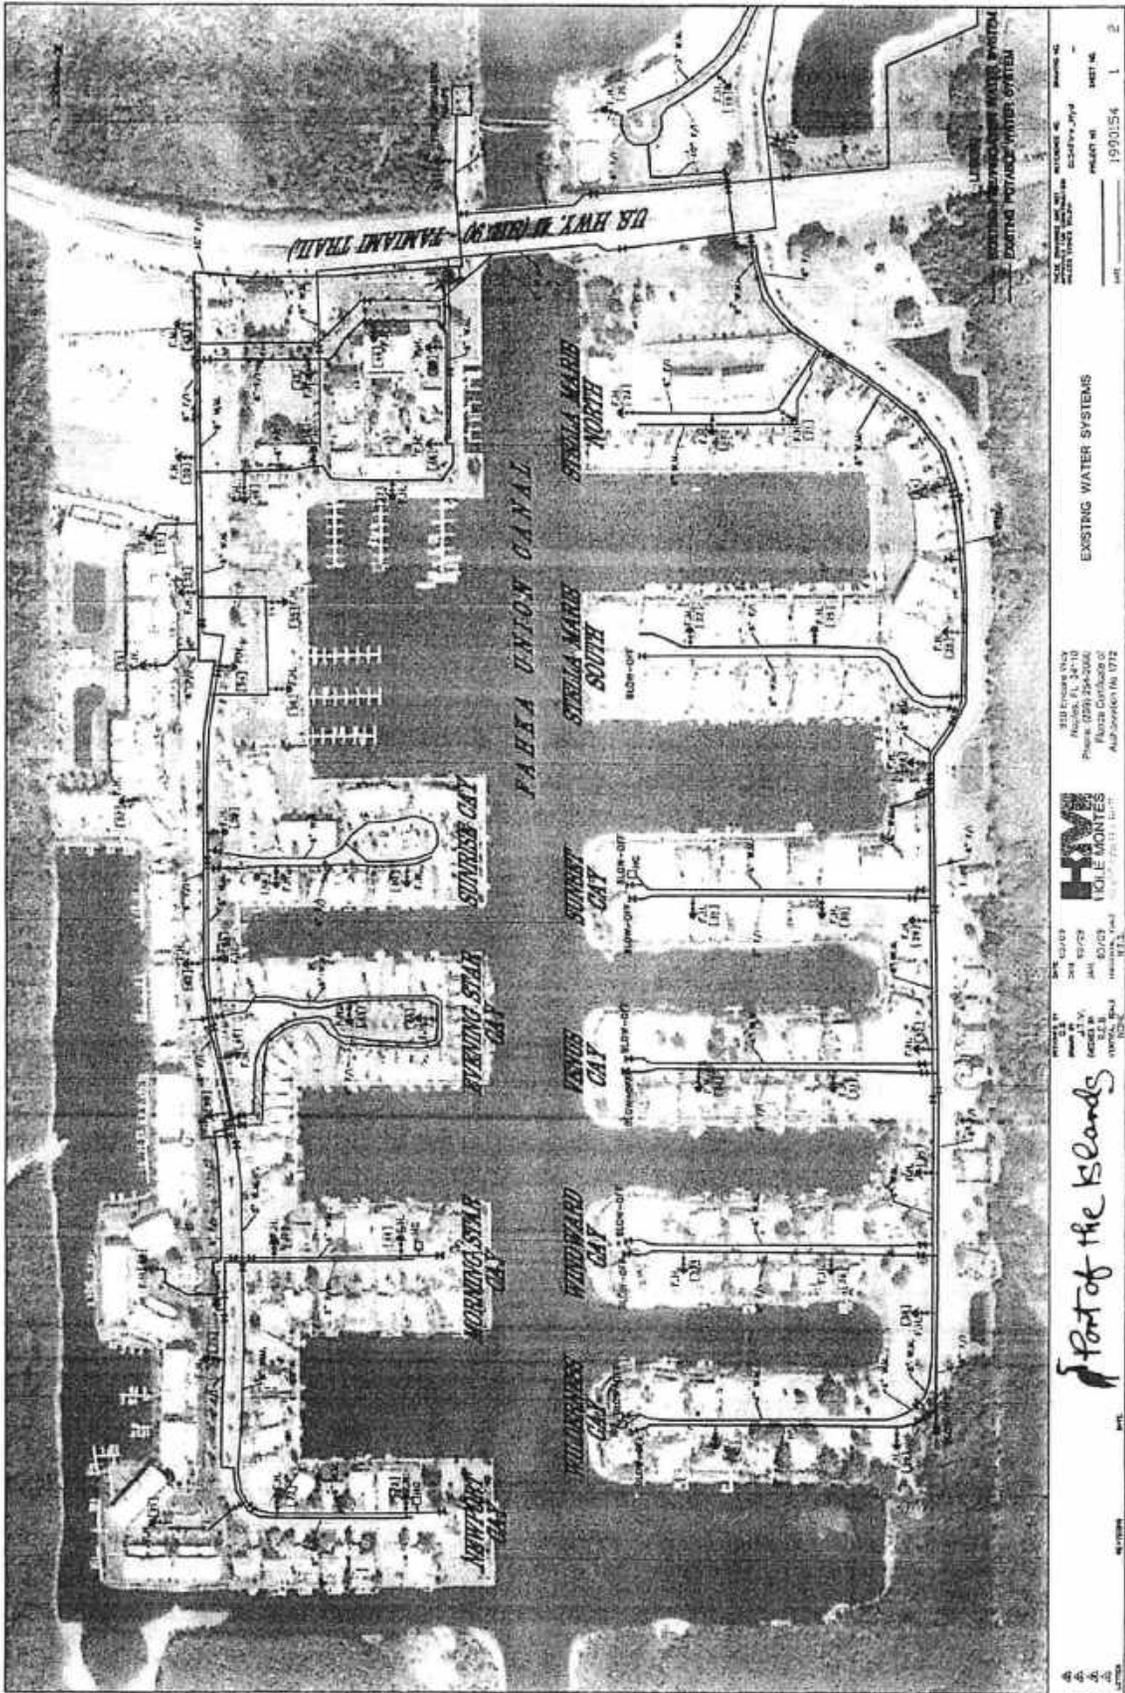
AERIAL PHOTO SHOWING LOCATION OF PROPOSED FACILITIES FOR PORT OF THE ISLANDS WELLFIELD.
